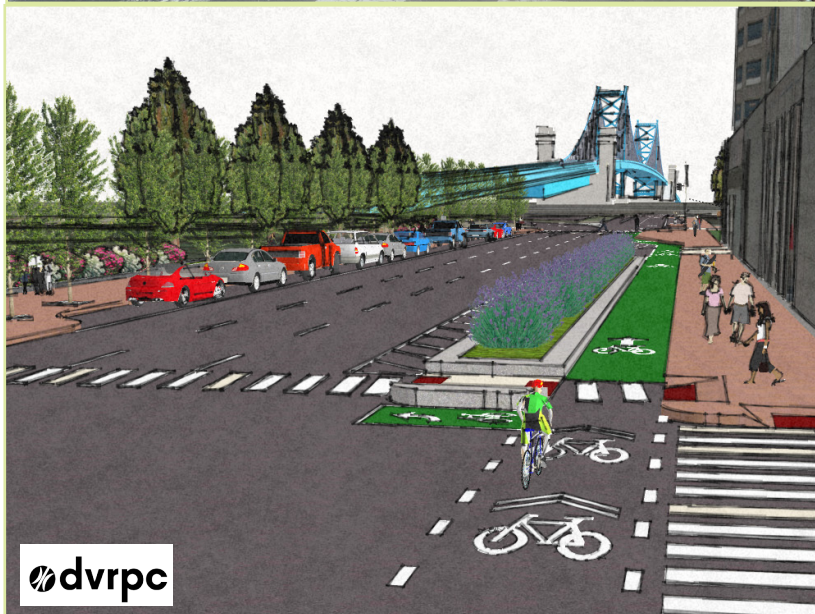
Proposed Design–Race at 6th Street looking west with new conceptual building development
